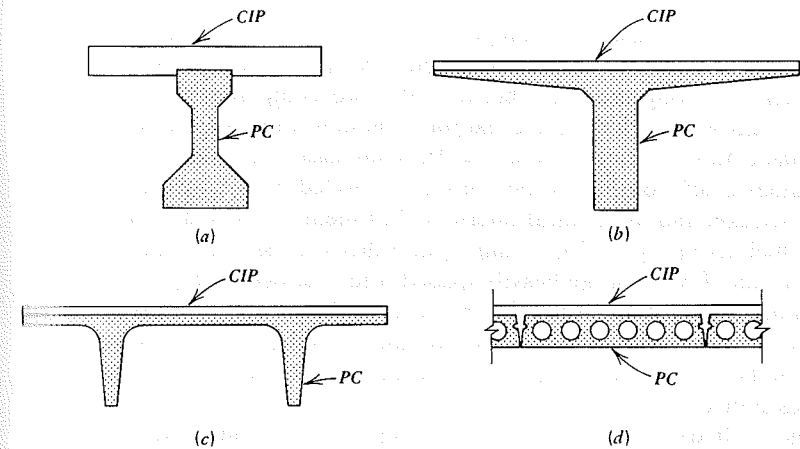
Typical composite sections. (a) AASHTO bridge girder. (b) Single-T girder. (c) Double-T beam. (d) Hollowcore slab.
